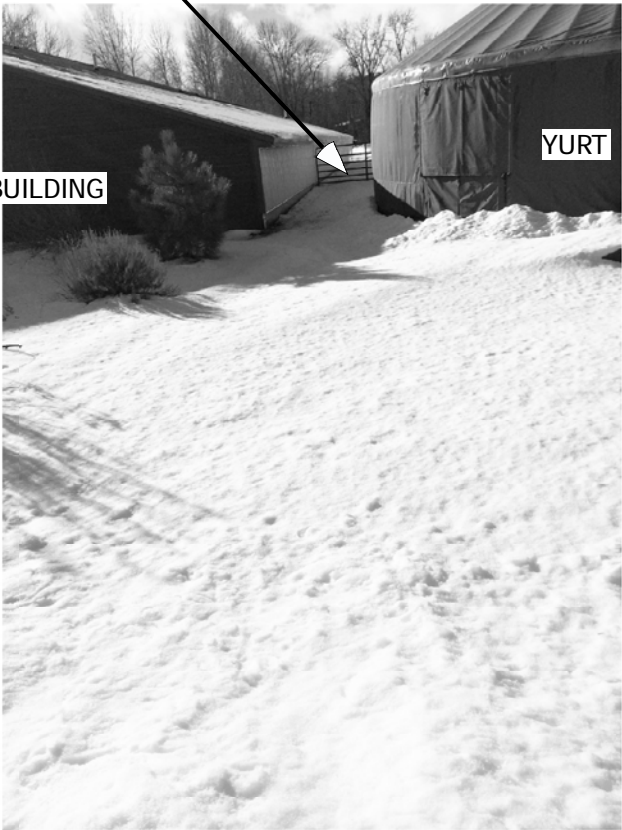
SIDE OF EXISTING BUILDING LOOKING FROM FRONT
